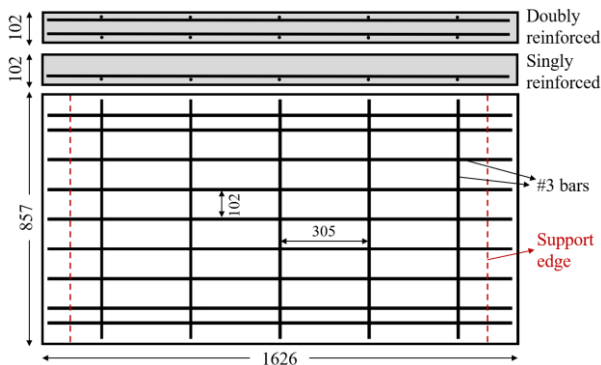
Details of US Army singly and doubly reinforced slab specimens (dimensions in mm; 1 mm=0.0394 in.)
